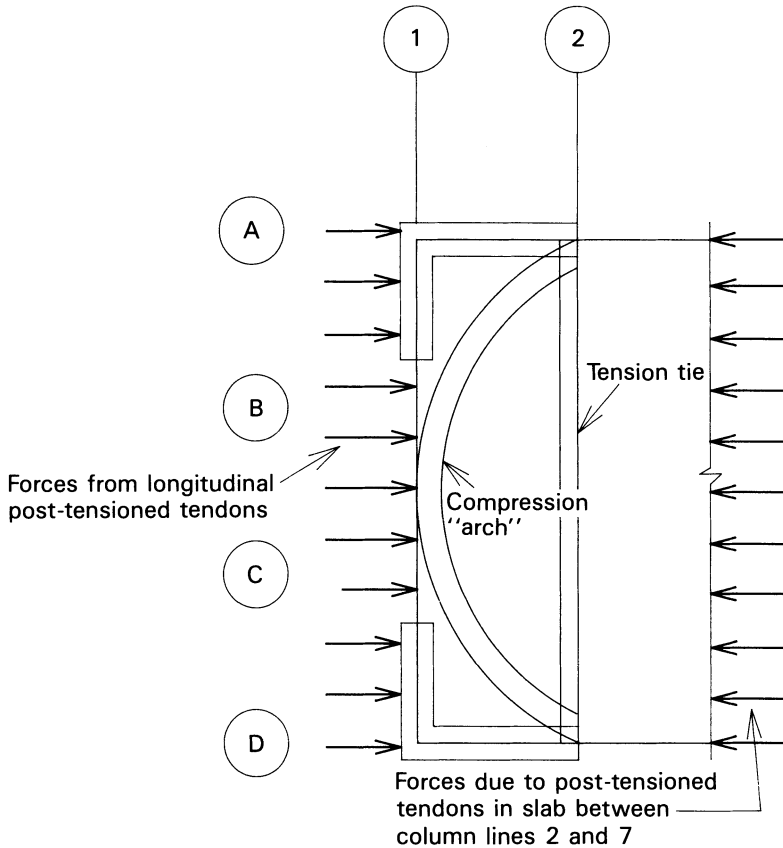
Partial plan of the building shown in Fig. 17-5, showing arch action of the prestressed-concrete roof at one of the narrow ends of the building.
